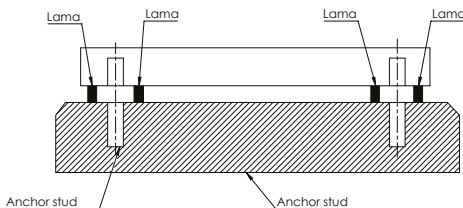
Foundation Concrete, lama and anchorage application
